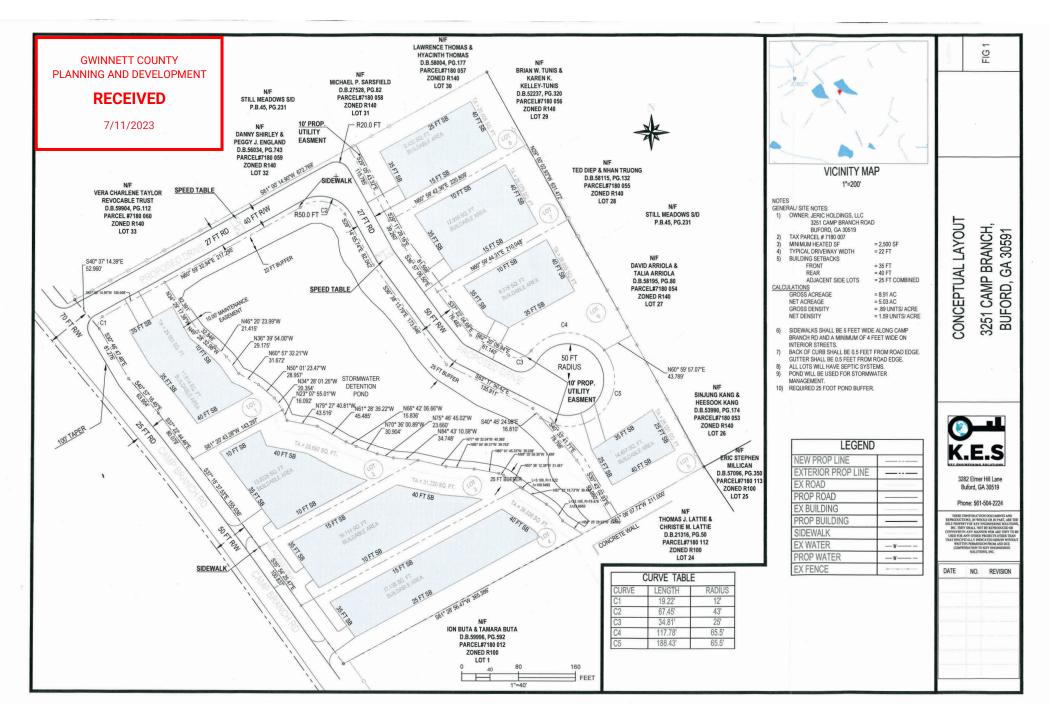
### Exhibit G: Site Plan and Building Elevations Presented at the July 11, 2023, Planning Commission Public Hearing
